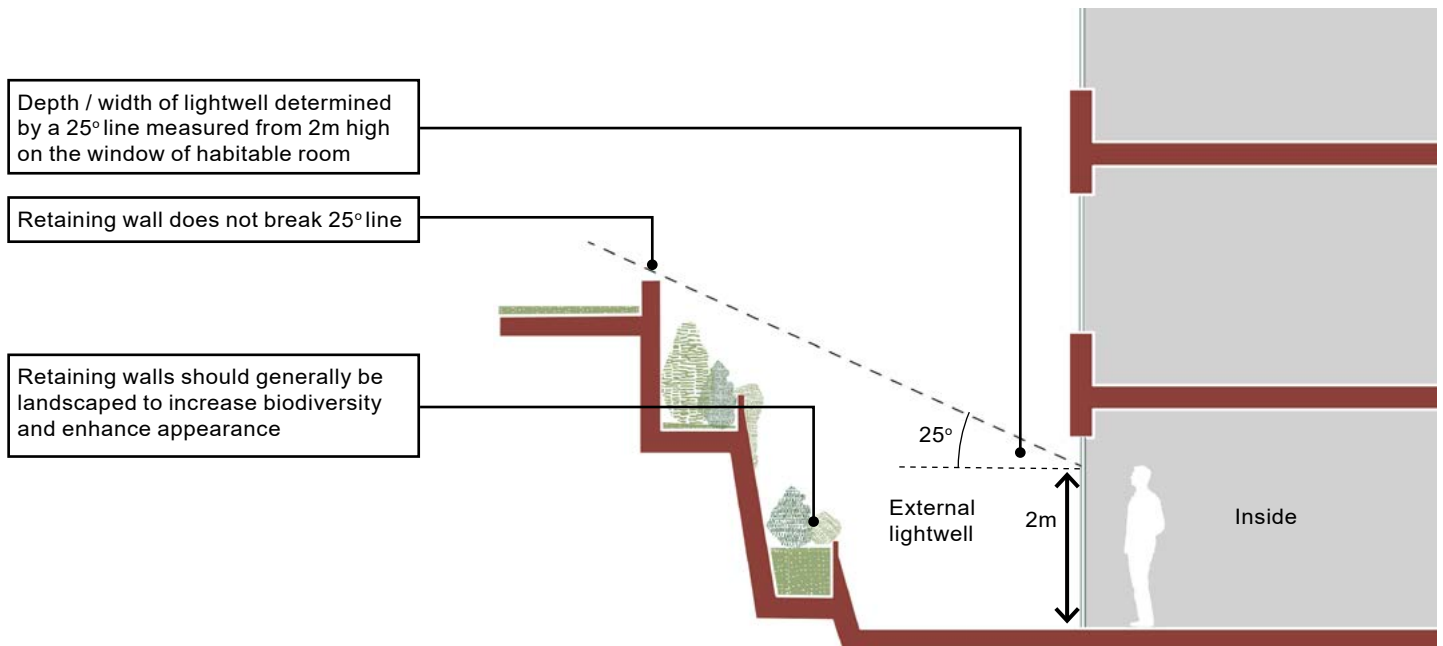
Section showing the design guidance for creating a light well for a basement or lower-ground floor.
